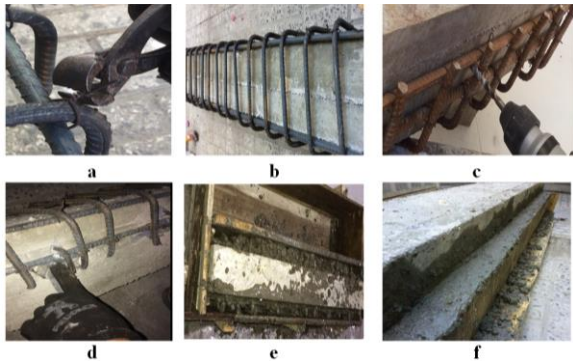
Steps of making and installing concrete jackets a: Making the steel reinforcement rebar b: Placing the steel rebar mesh on the beam c: Creating cavities on the surfaces of the main beams D: Installing L-shaped rebars using epoxy adhesive inside the cavities e: Concreting of jackets f: beam after concreting
